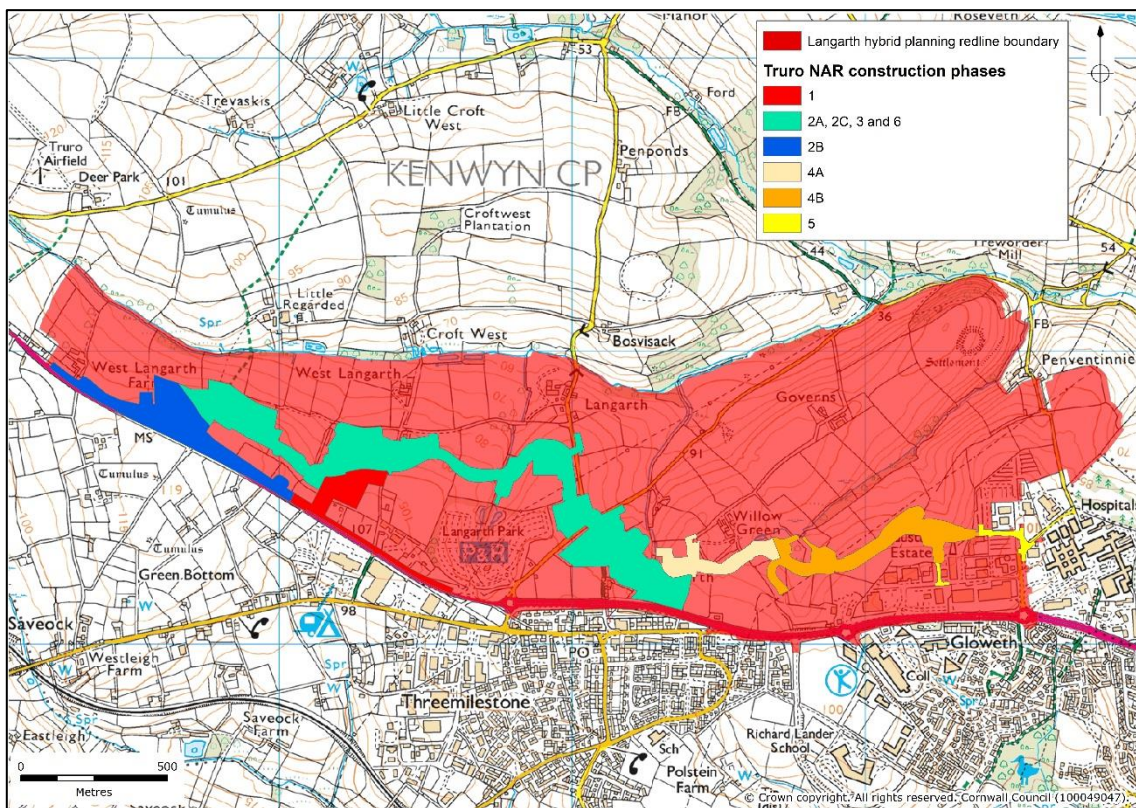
Site extent, showing the Langarth hybrid outline planning redline area and the Truro NAR construction phases.
